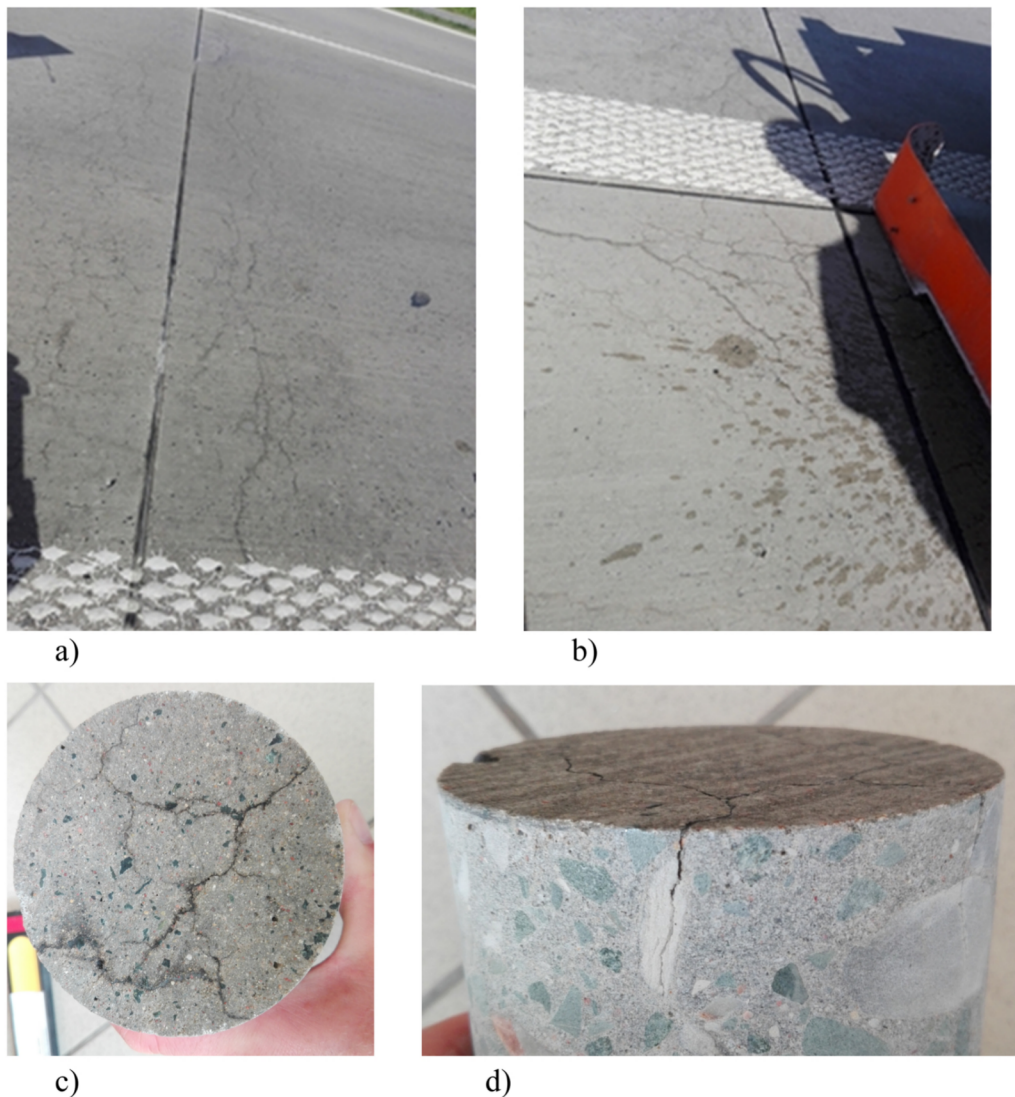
Typical cracks and crack patterns observed at the surface near joints in highway pavement (a, b) and in the cores ϕ 100 mm taken from the pavement (c,d).
